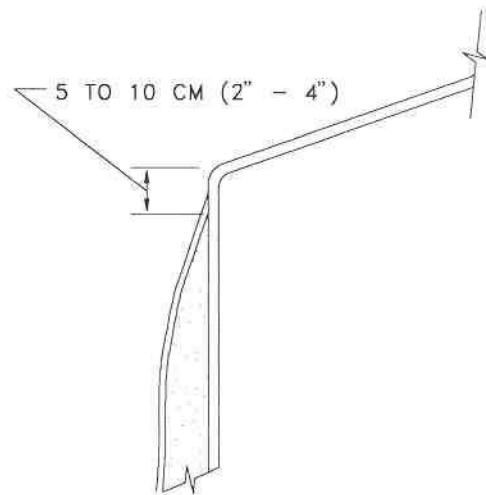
TYPICAL INSTALLATIONS - SHELL,
